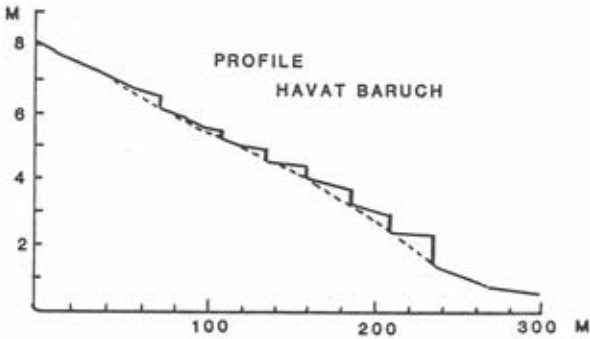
Longitudinal profile of the farming area that was surrounded by a rock wall within which 7 dams were built at Havat Baruch, near Avdat, Israel. Crops were grown on the sediment deposited behind the dams.
